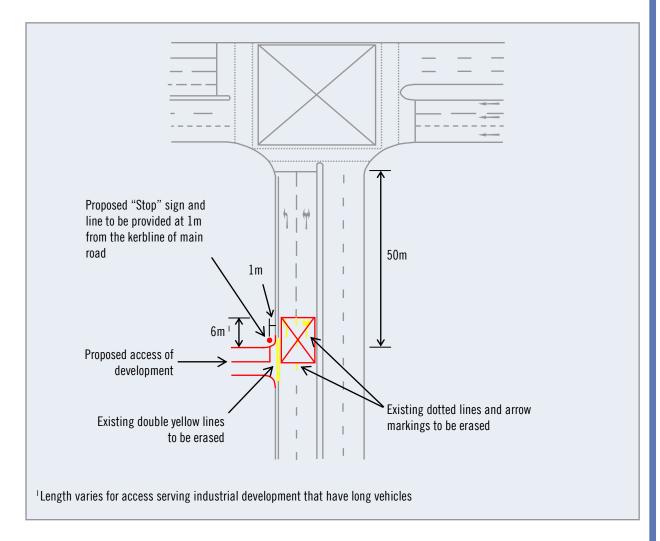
Proposed Development Access Meeting a Road near a Junction
